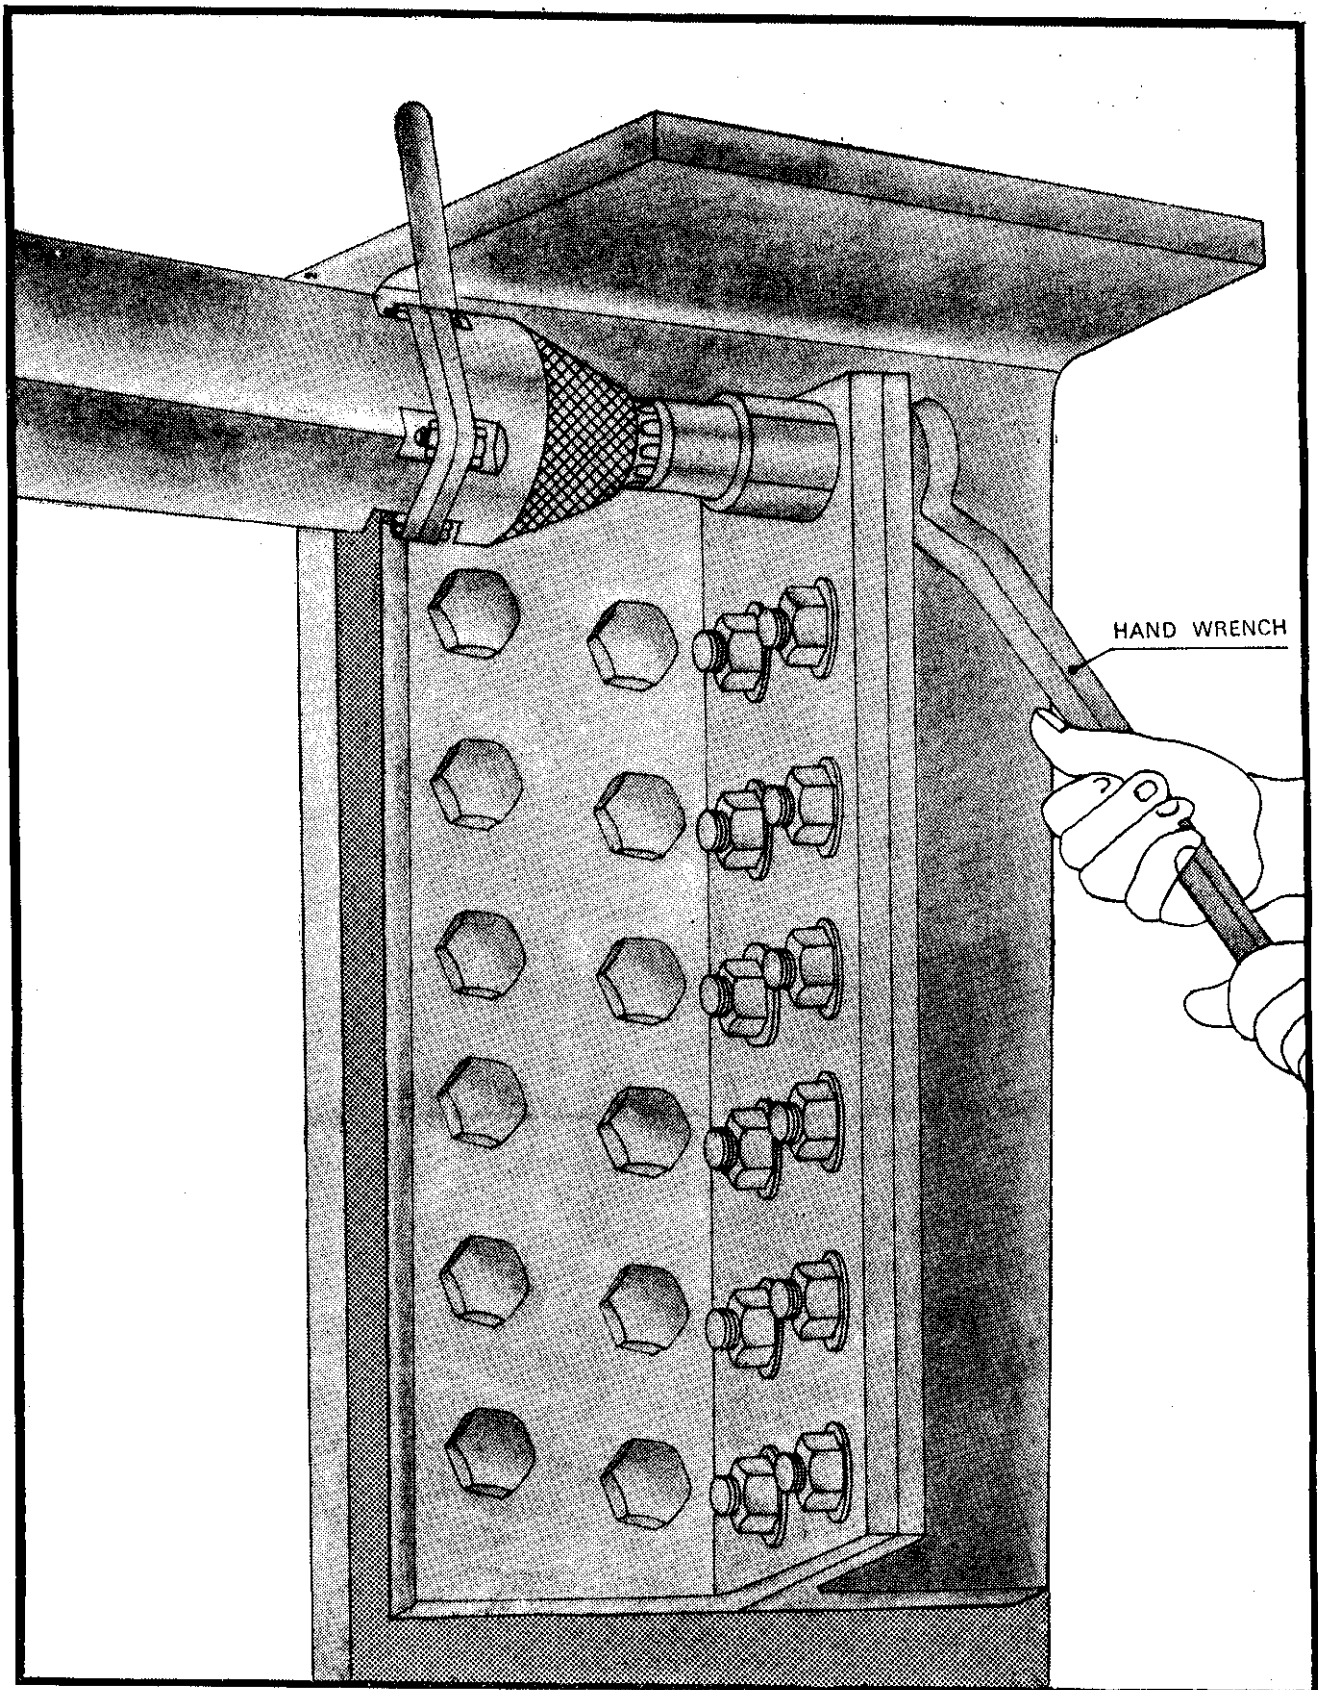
FINAL TIGHTENING BEYOND SNUG OF BOLT No. 2
